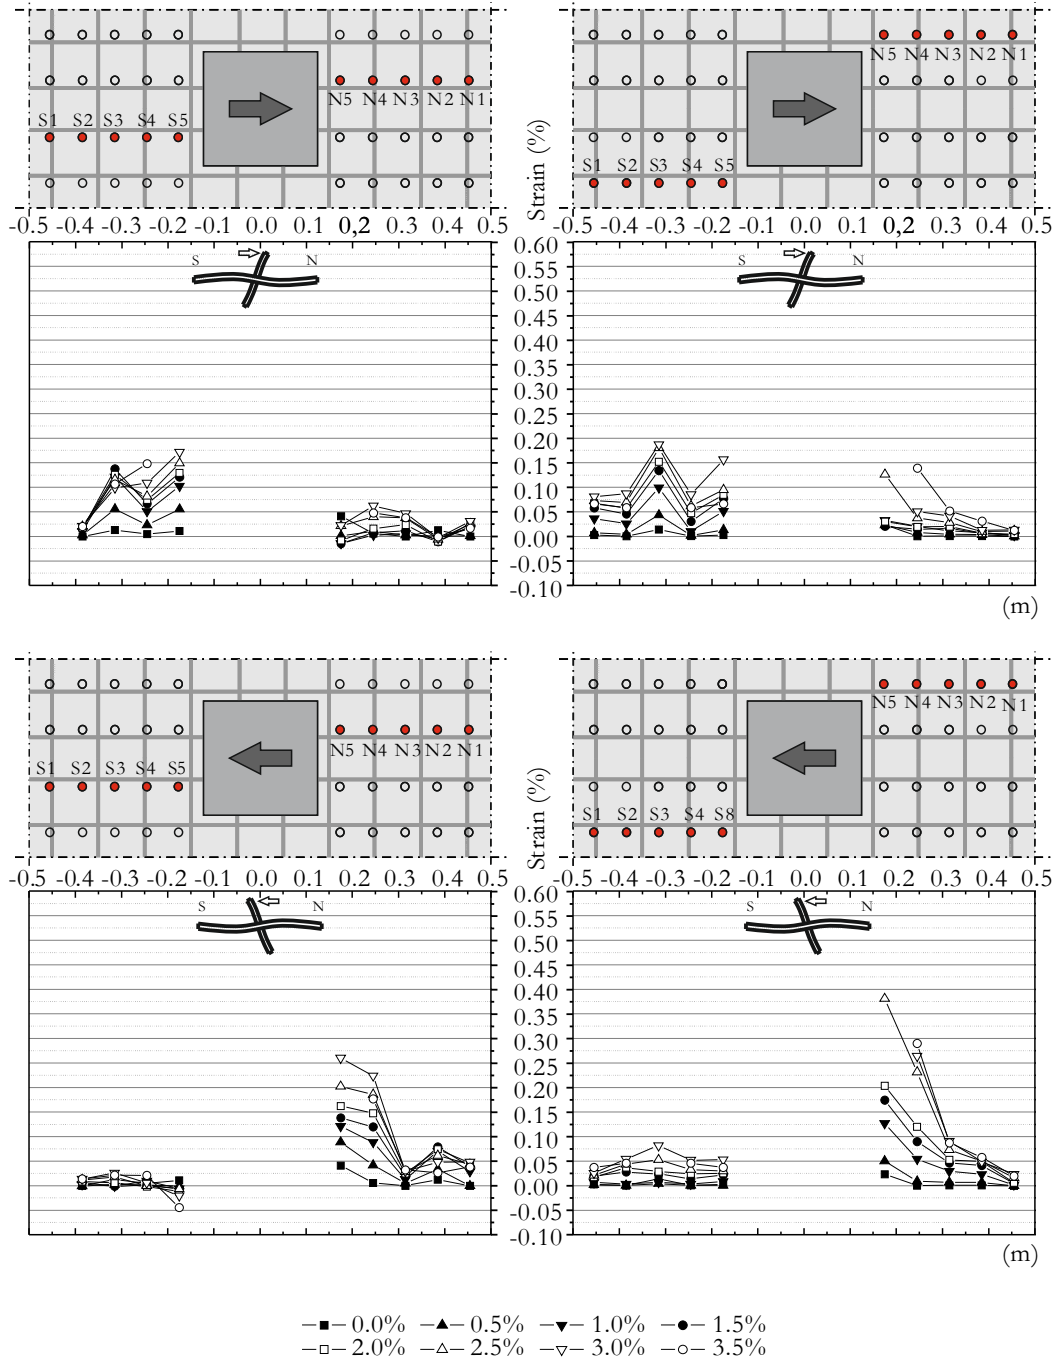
Strains in the shear reinforcement stirrups of the C-50 STR3 specimen.
